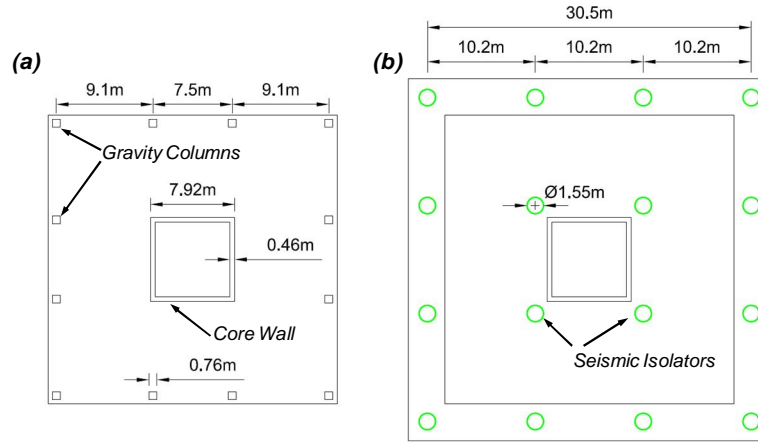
Plan view of: (a) floor above ground, and (b) isolation plane below ground.
